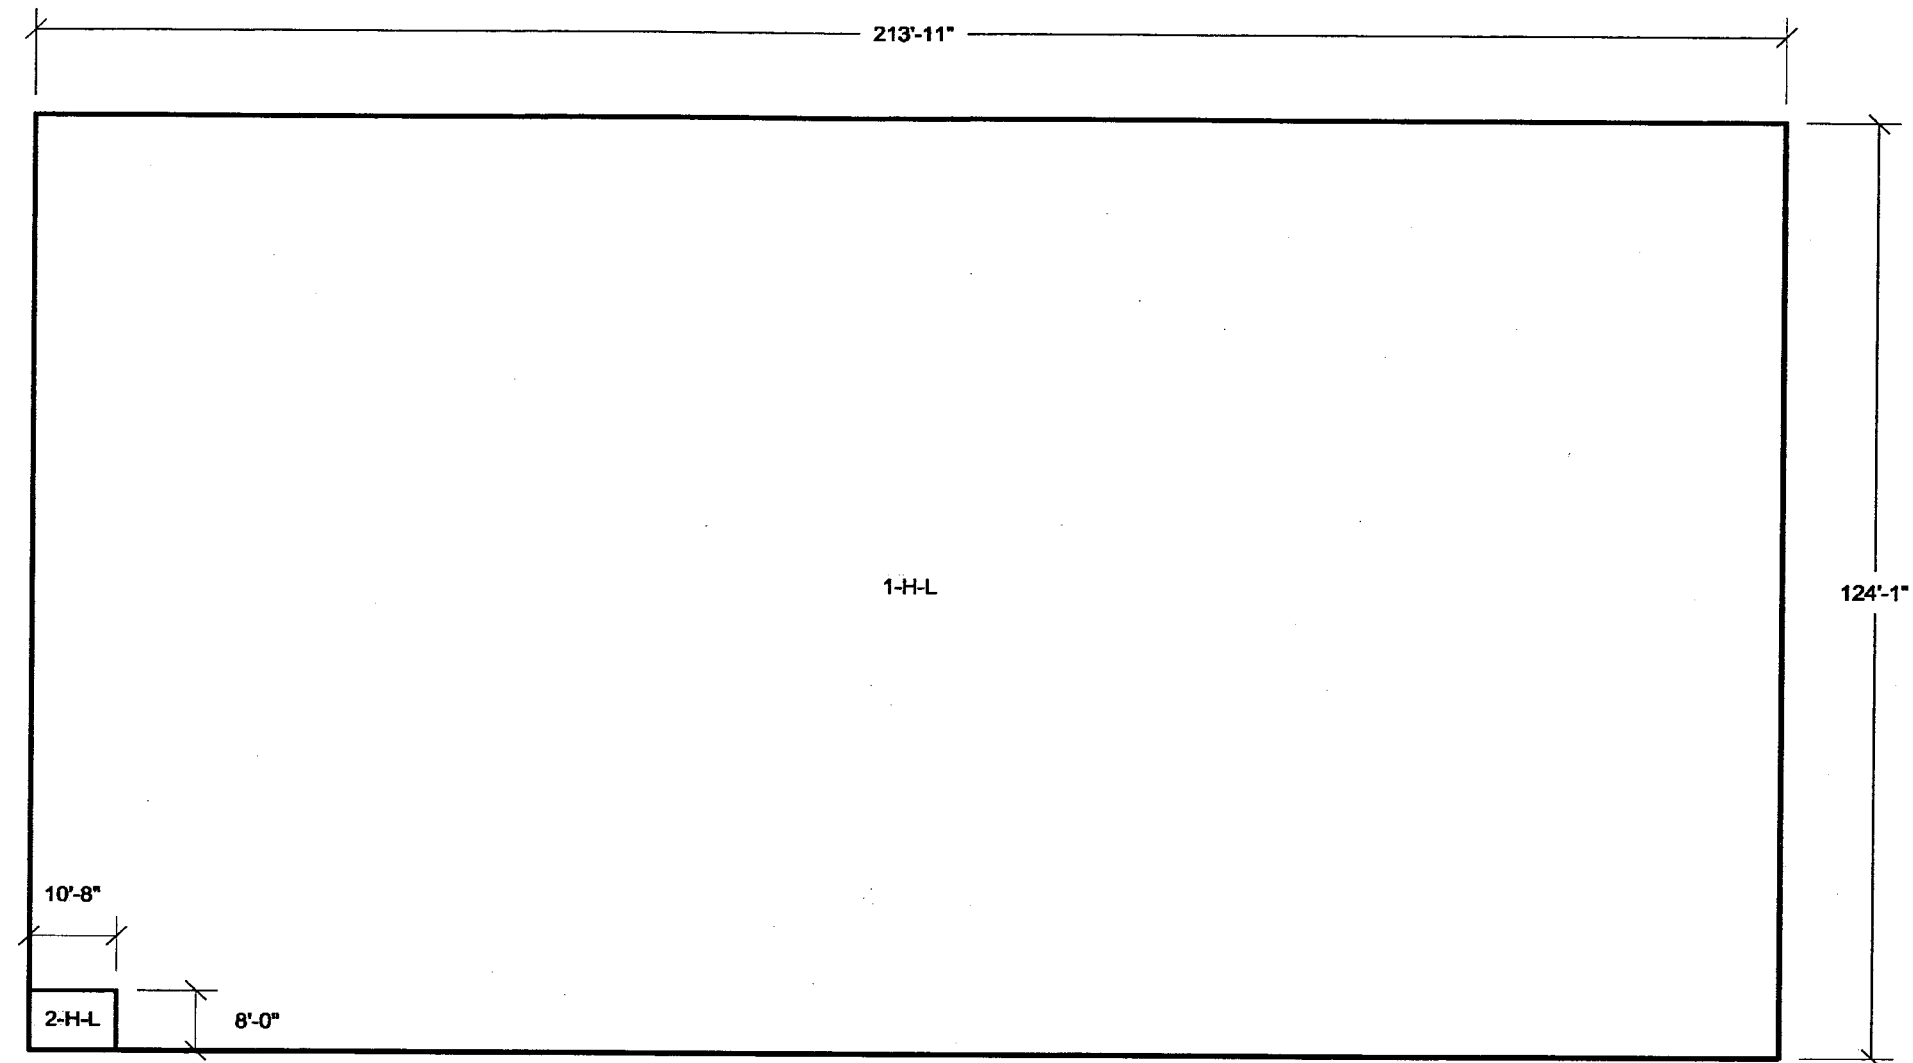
H.3-37a: ELEVATION 35 LOOKING DOWN
